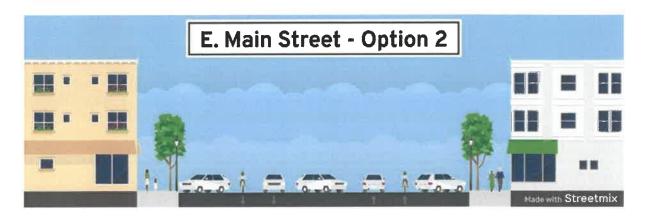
Downtown Streetscape Alternate Layout - Option 2
